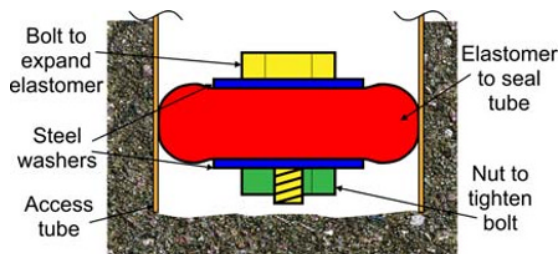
Elastomer seal for access tube bottom. The elastomer may be cut from a rubber bung or made from a ball of suitable size. An alternative is to use several rubber washers, each separated by a smaller diameter metal washer.
